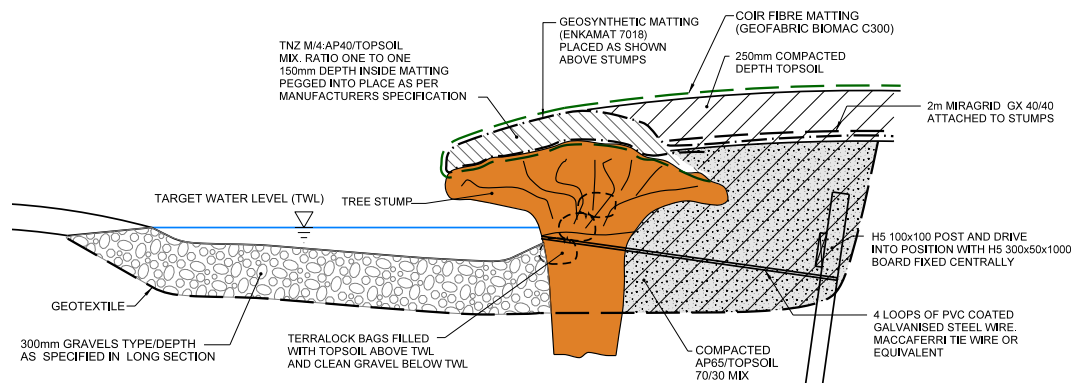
Design details for an inverted tree trunk in a river bank. Driving stumps with a longer (c. 3 m), sharpened trunk into the bank at an angle is being considered as an alternative to reduce cost.
